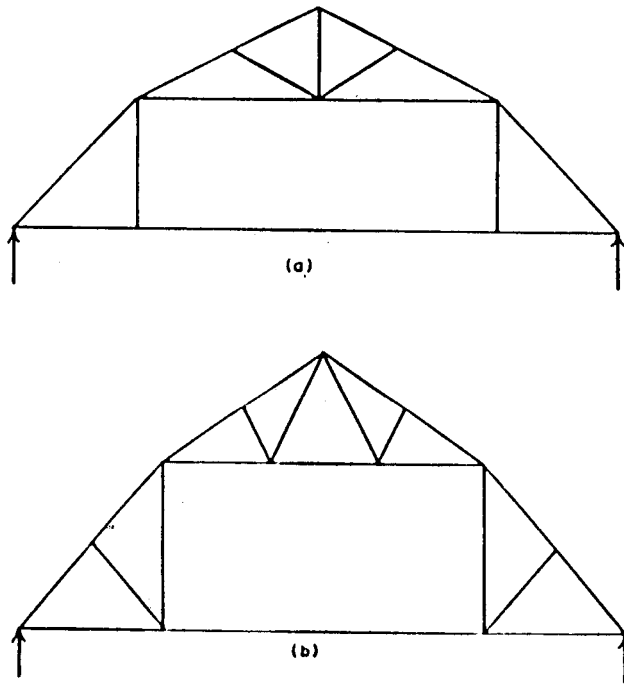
FIG ALTERNATIVE FORMS OF MANSARD TRUSSES
